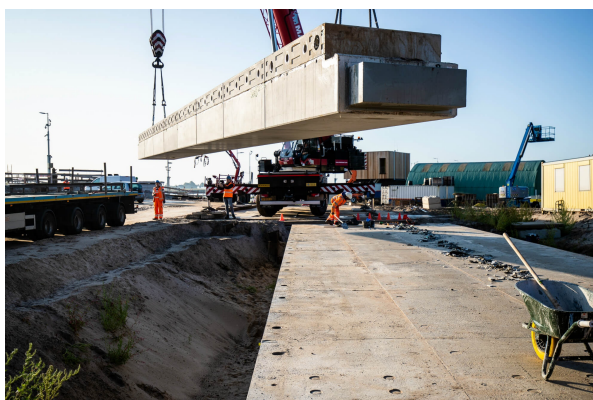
Circular concrete highway bridge (Rijkswaterstaat, 2019c)
